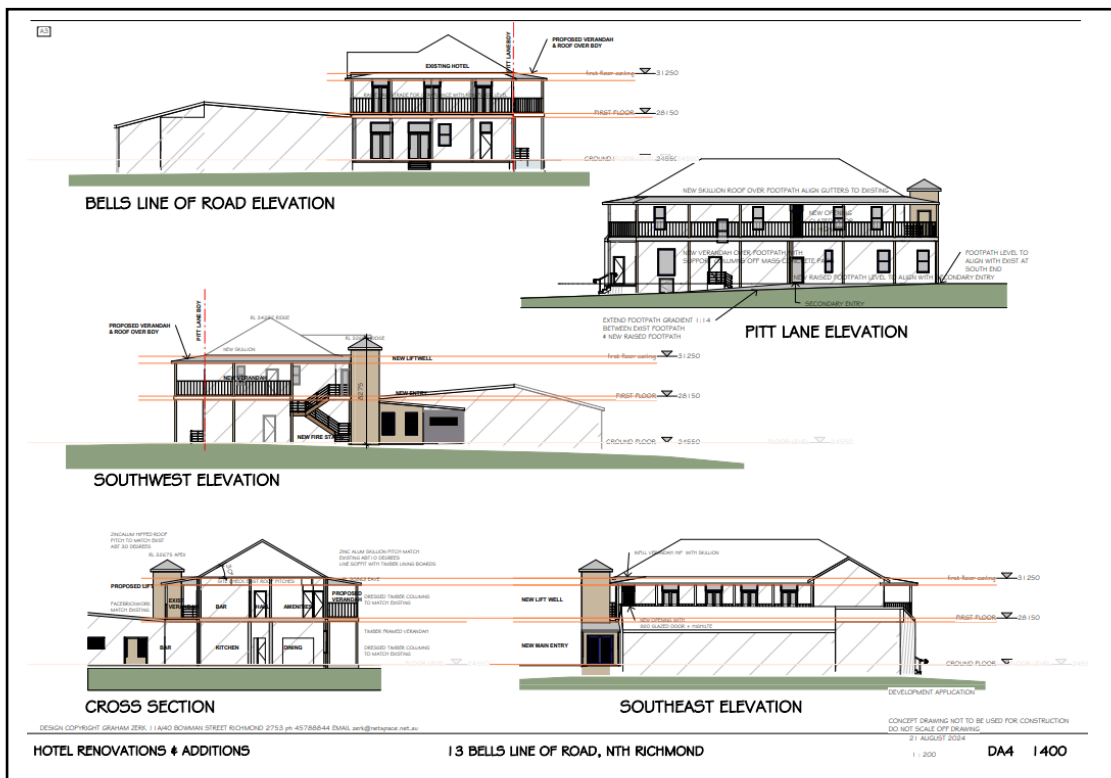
Elevation Plan (Source: Graham Zerk, 21 August 2024).
